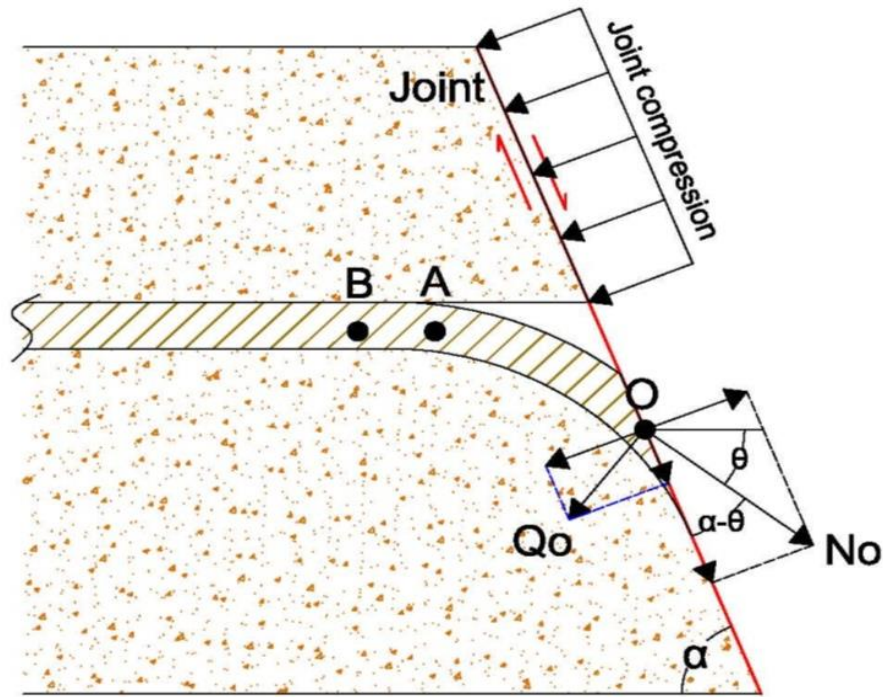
Forces induced in a bolt and on the bolted joint plane
